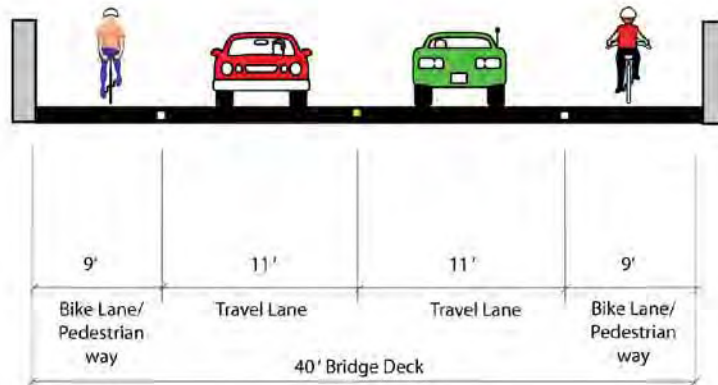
C. Beck Road Overpass Retro-fit Cross Section
